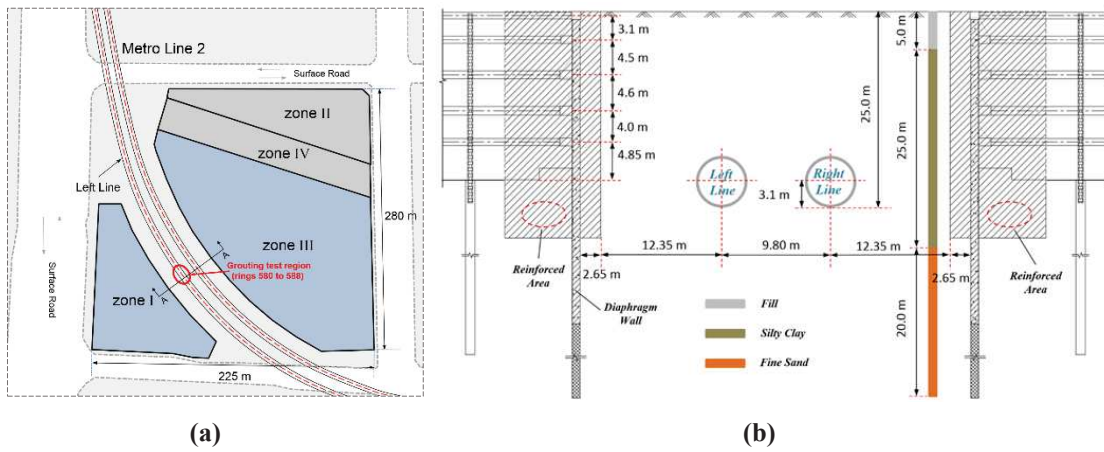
Excavation zone and existed tunnels: (a)Plain view, (b)Side view
